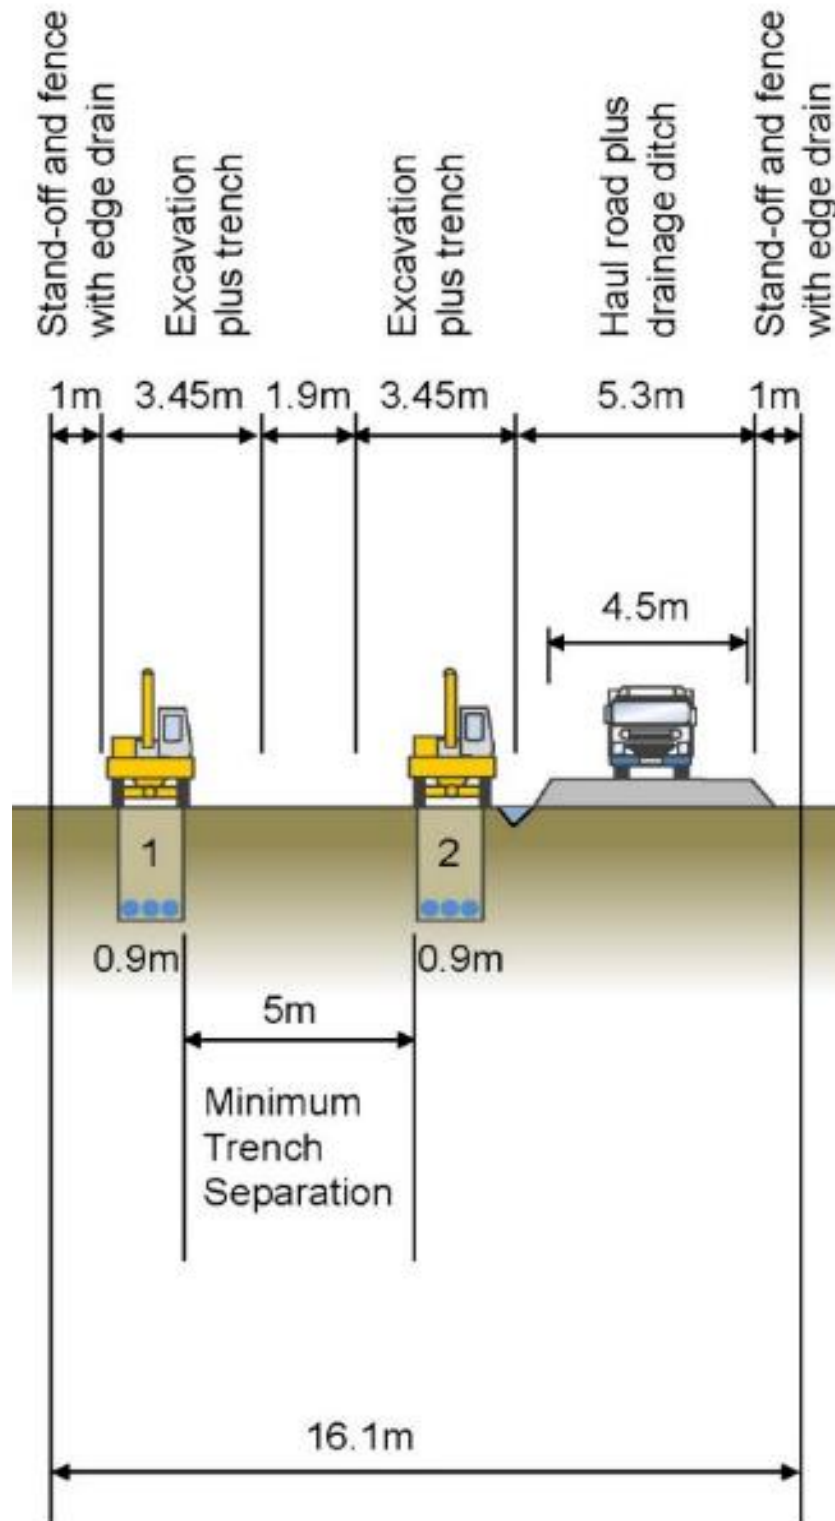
Indicative Cable Trenching Arrangement and Working Area for Reduced Onshore Cable Route Width (not applicable to reduced onshore cable route width in Cable Section 4 – west of Snape Road)
